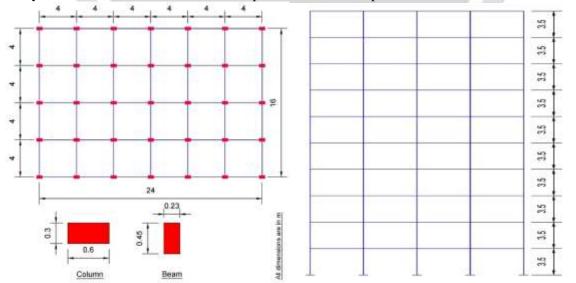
2D layout and front elevation plane of proposed model with column and beam cross-section
